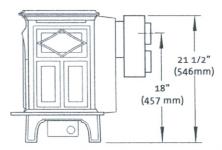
Co-Linear Adaptor dimensions with Plinth legs.
